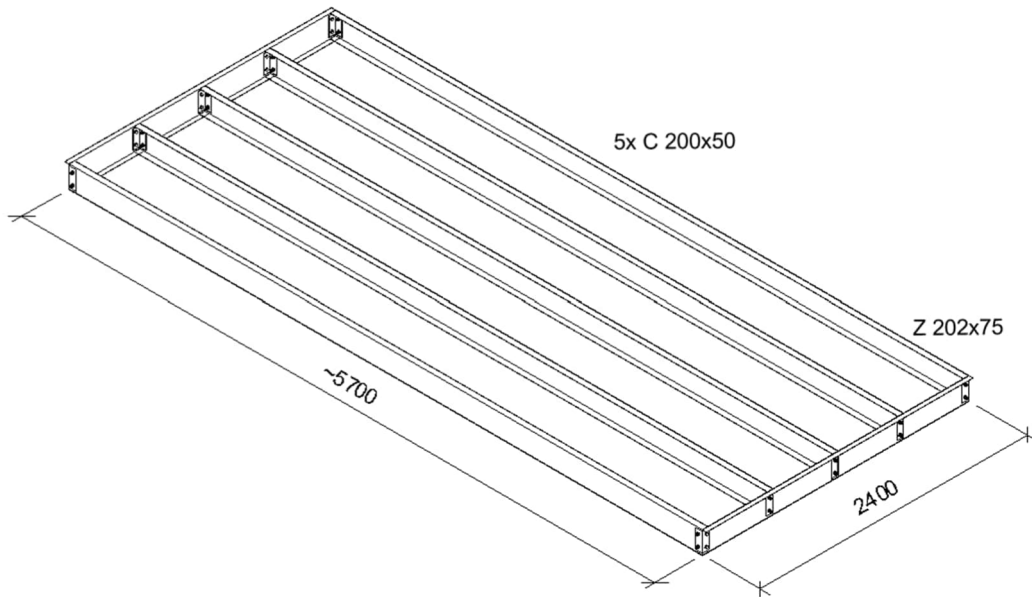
Light steel cassette used in pre-fabricated roof construction for 6m beam spacing (less the beam width of nominally 300mm) [5]
